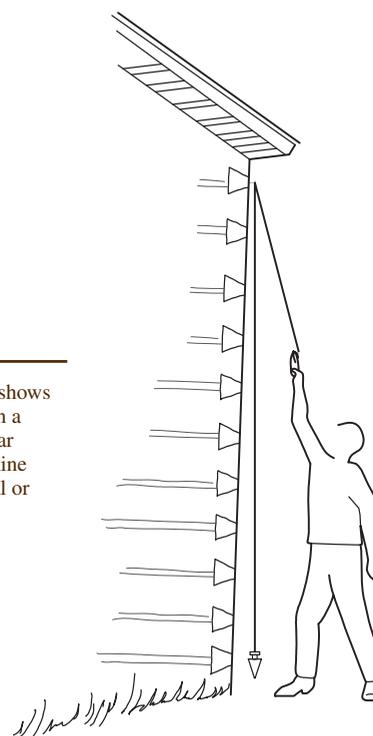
This drawing shows how to use a plumb bob on a string hung from a nail near the top of a wall to determine whether the wall is vertical or leaning.
